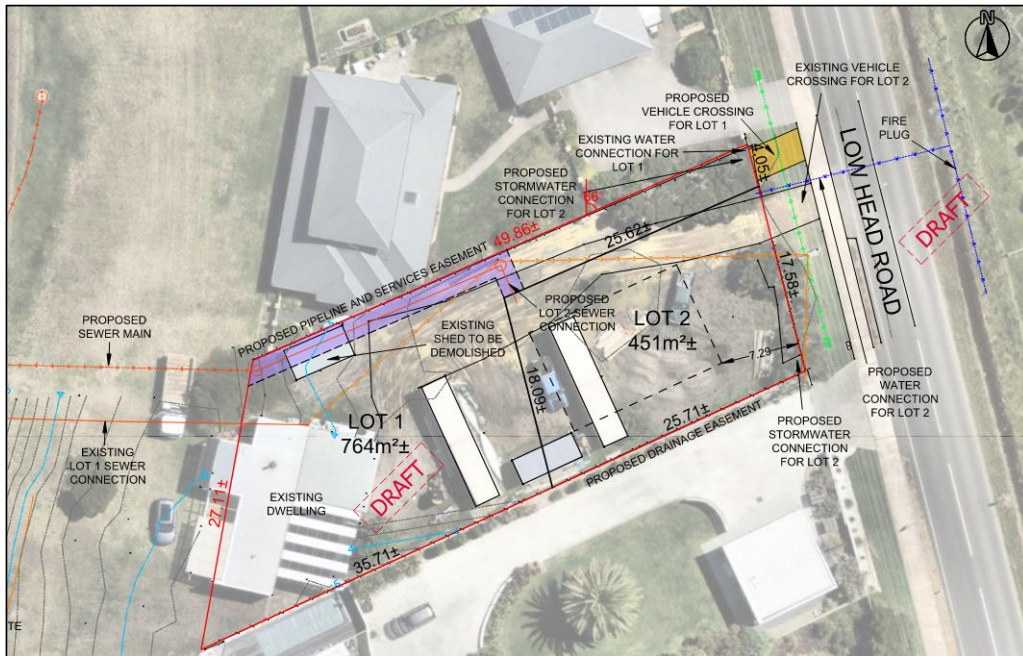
Proposal Plan. Source: Nova Land Consulting
